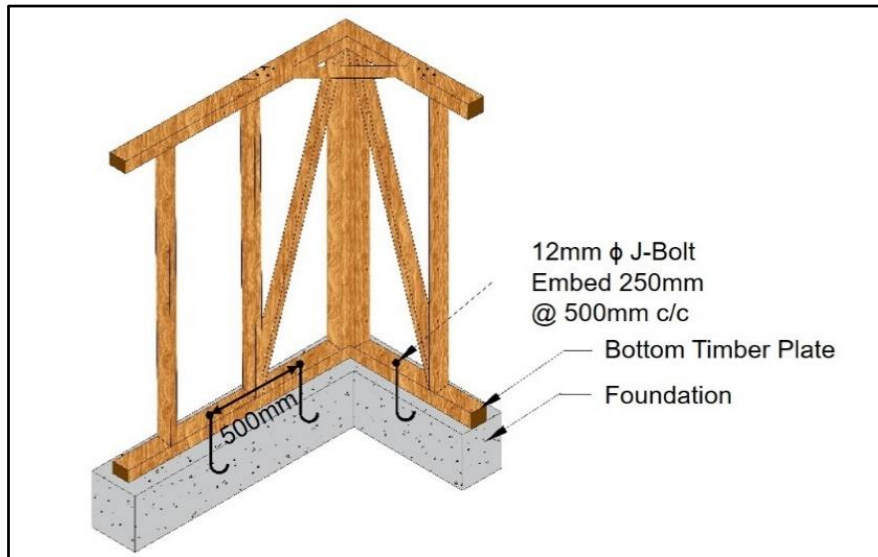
ANCHORING OF BOTTOM TIMBER PLATE TO FOUNDATION
